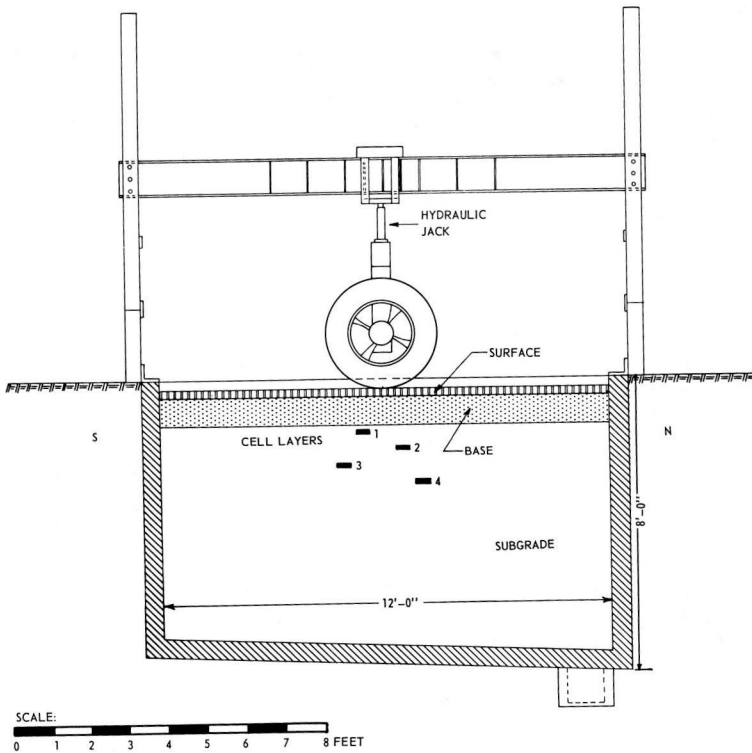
Cross-section of the test pit showing position of layers of pressure cells and the loading equipment.
